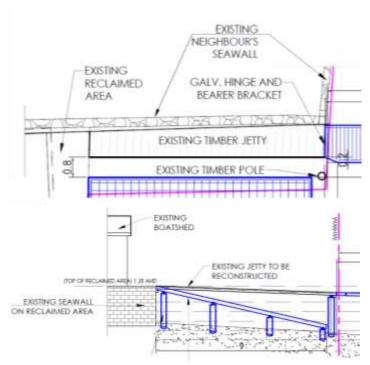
Floor plan and elevation of proposed jetty reconstruction.
